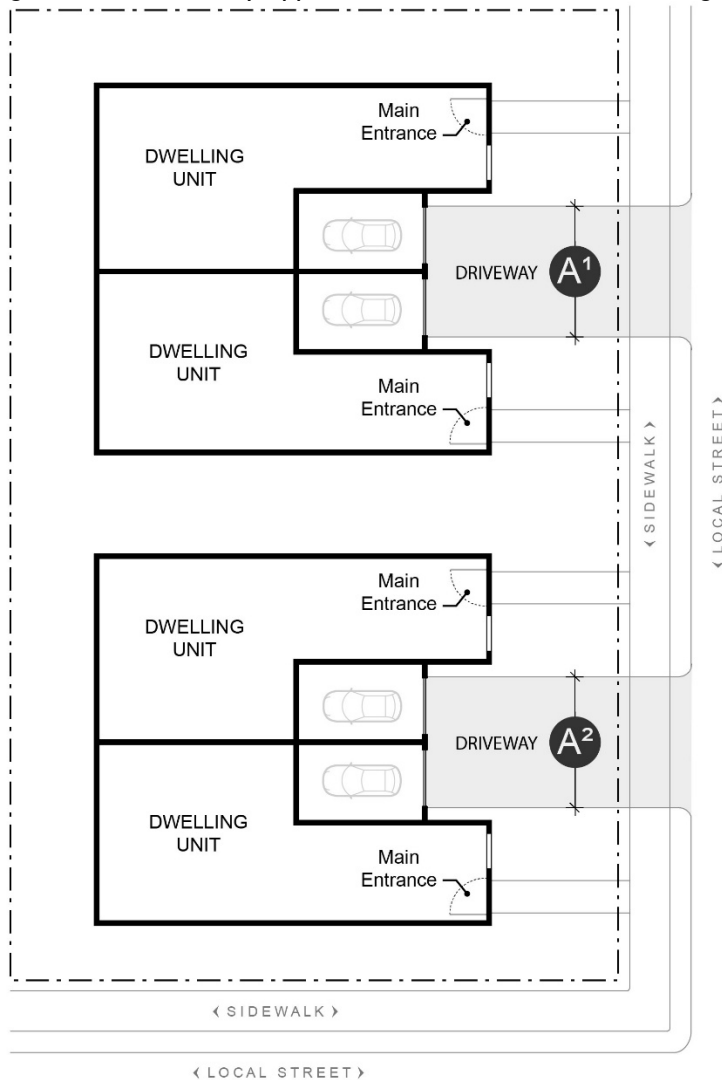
c. Driveway Approach Width on Local Street – Shared Driveway
